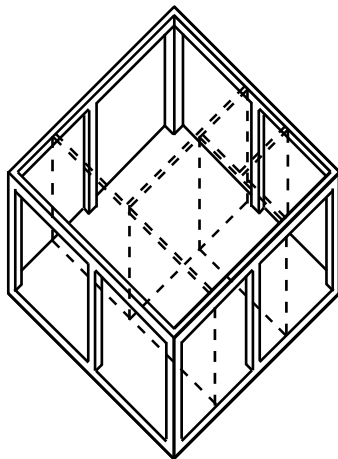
The beam and column construction means that there are no loadbearing walls allowing any combination of internal and external non-loadbearing walls.
